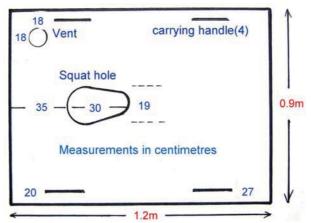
Measurements for the 1.2m X 0.9m concrete slab
